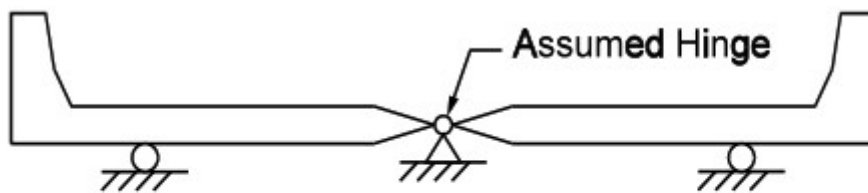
Notional Model for Applying Lever Rule to Three-girder Bridges
